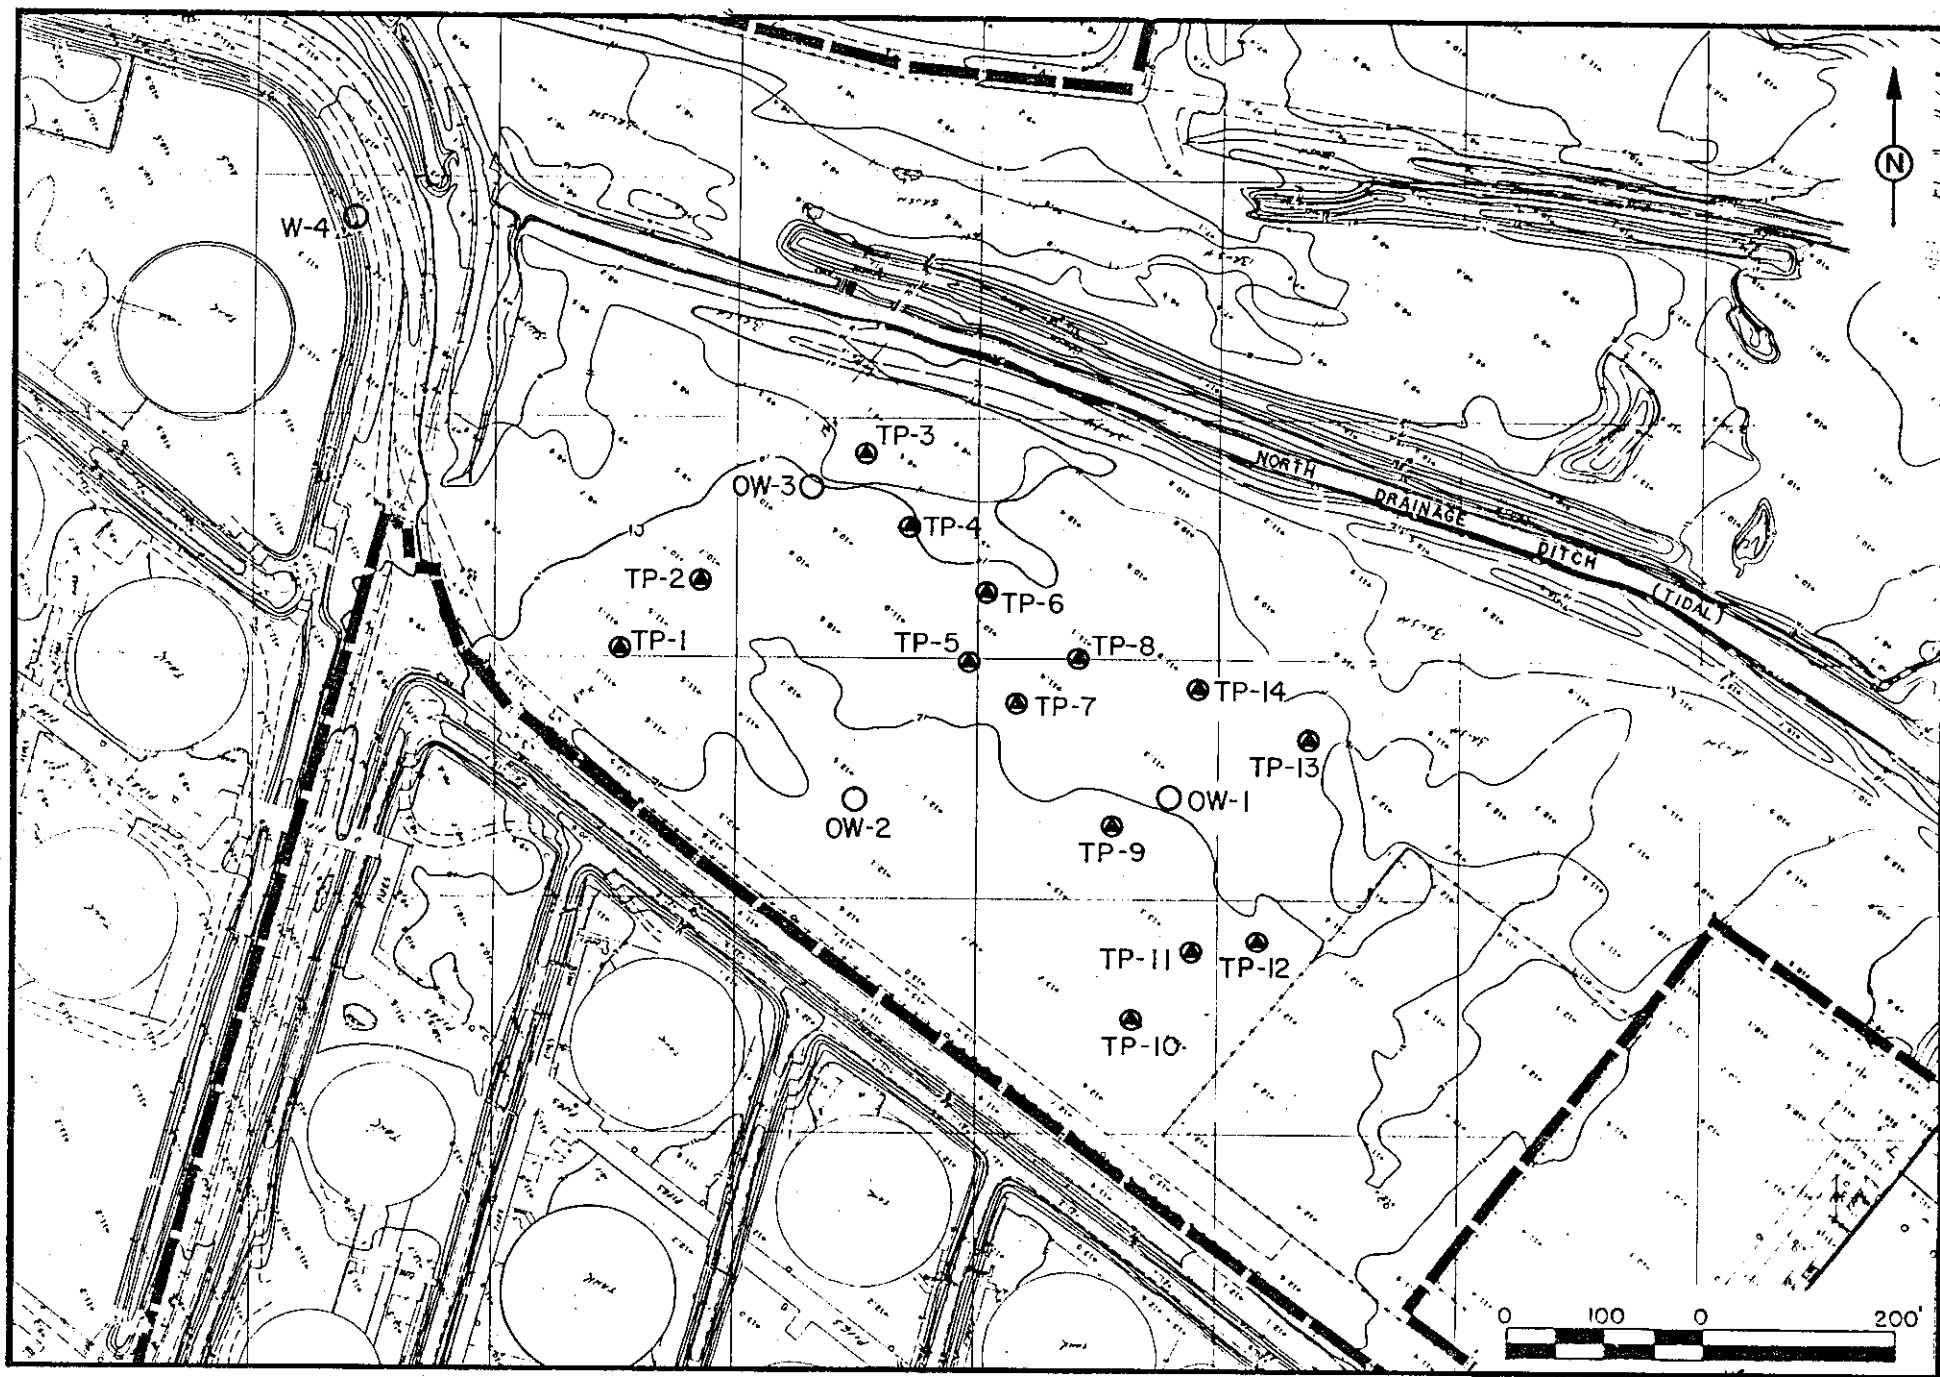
LOCATIONS OF TEST PITS EXCAVATED ON 11/14/84
